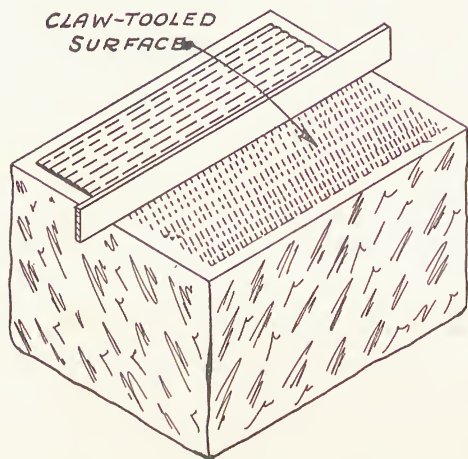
CLAWTOOLING AND BOASTING A SURFACE.
